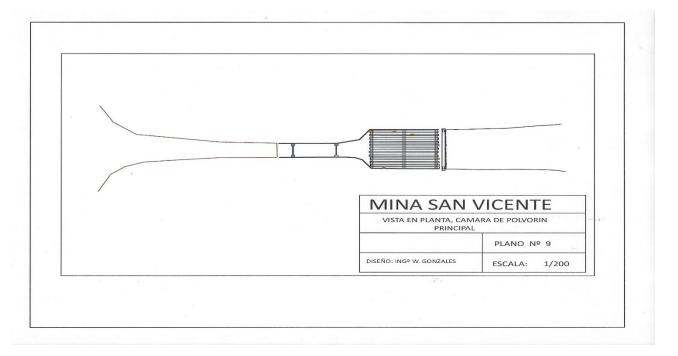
Floor Plan of the Fine Blasting Powder Chamber
